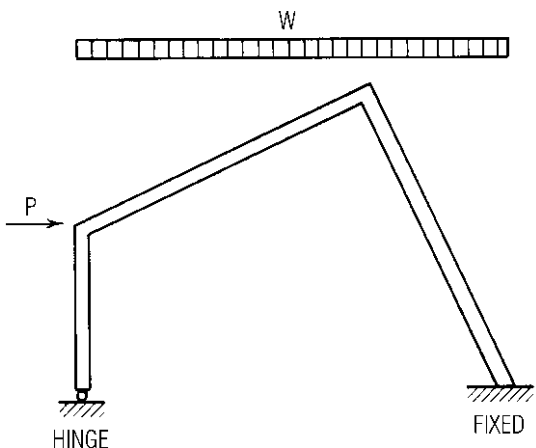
Rigid frame with sloping beam, one vertical column, and one sloping column.
